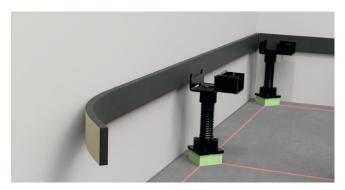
Mount self-adhesive elastic strip VT-Stripe on the walls at the height of future floor boards.
